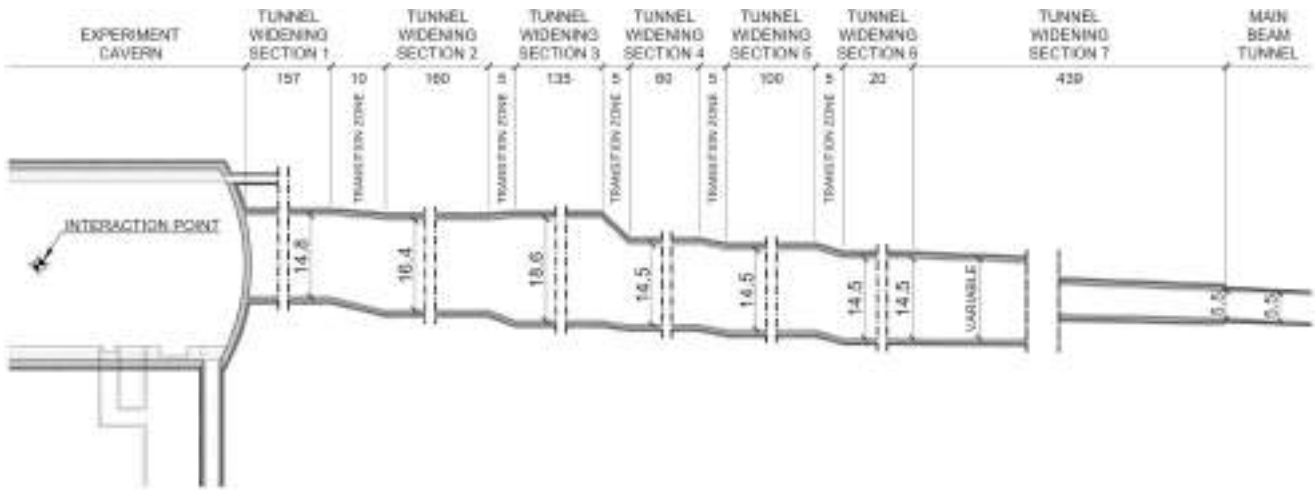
Plan view of the typical tunnel widening at an experiment cavern
